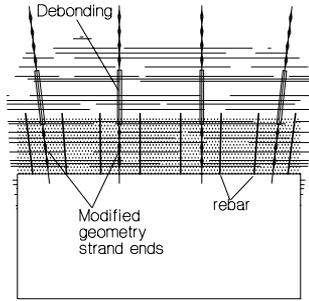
Composite cablebolt - rebar support (Plain strand, plated cablebolts can also be used in less severe conditions.)
